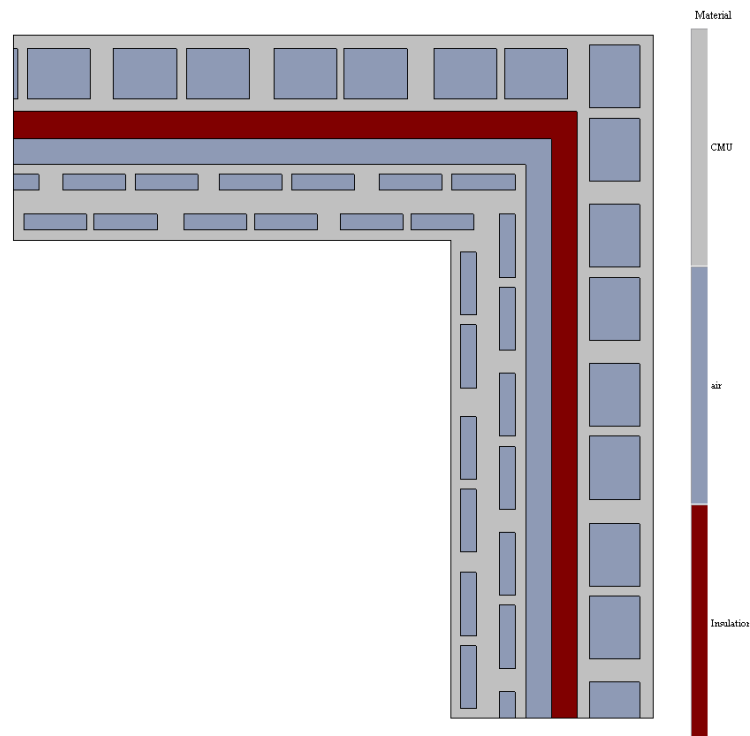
Wall/wall intersection model of Bldg 1552, Fort Carson, CO. Grey indicates the CMU concrete, red indicates the insulation and light purple indicates the air spaces.
